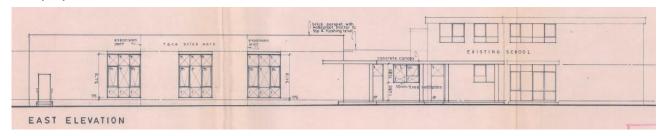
Drawing related to building permit 7845. Proposed east elevation (Nicholas Katris & Assoc. June 1979) (Source: Council Building File)
